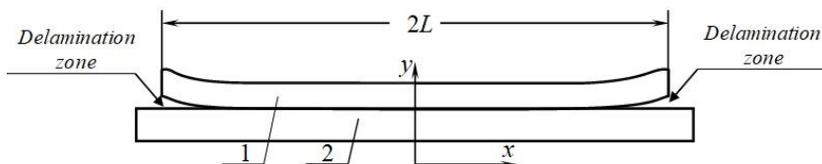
Cross-sectional diagram of asphalt concrete pavement 1 on rigid base 2 of a road or bridge
